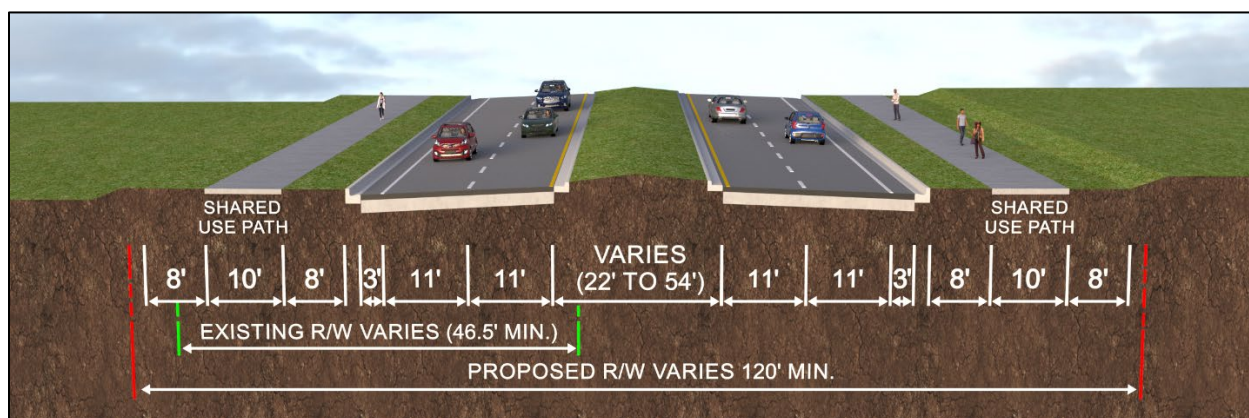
| Branch Forbes Road – Proposed Typical Section Under I-4
